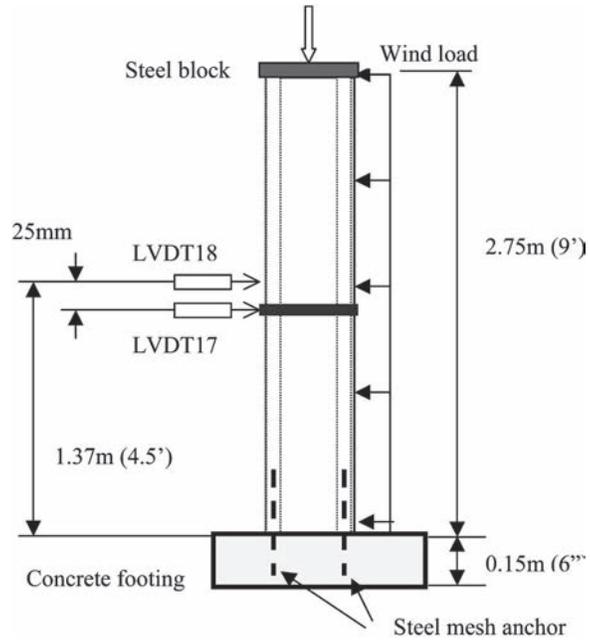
Side view of sandwich wall (wall thickness = 0.355m)
